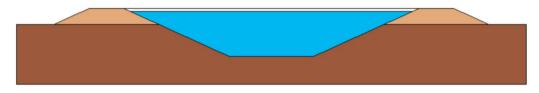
Cross-section of a pit storage tank (PTES). Source: PlanEnergi via [9].
